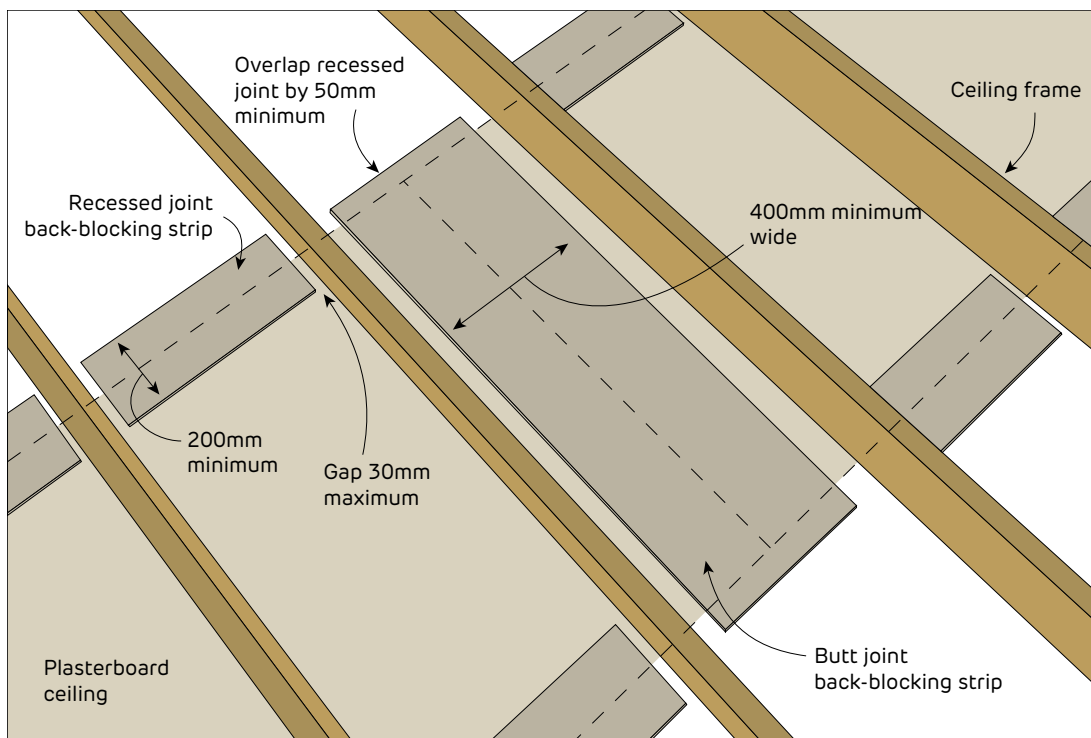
Placement of Back-Blocking Strips For Recessed and Butt Joints
